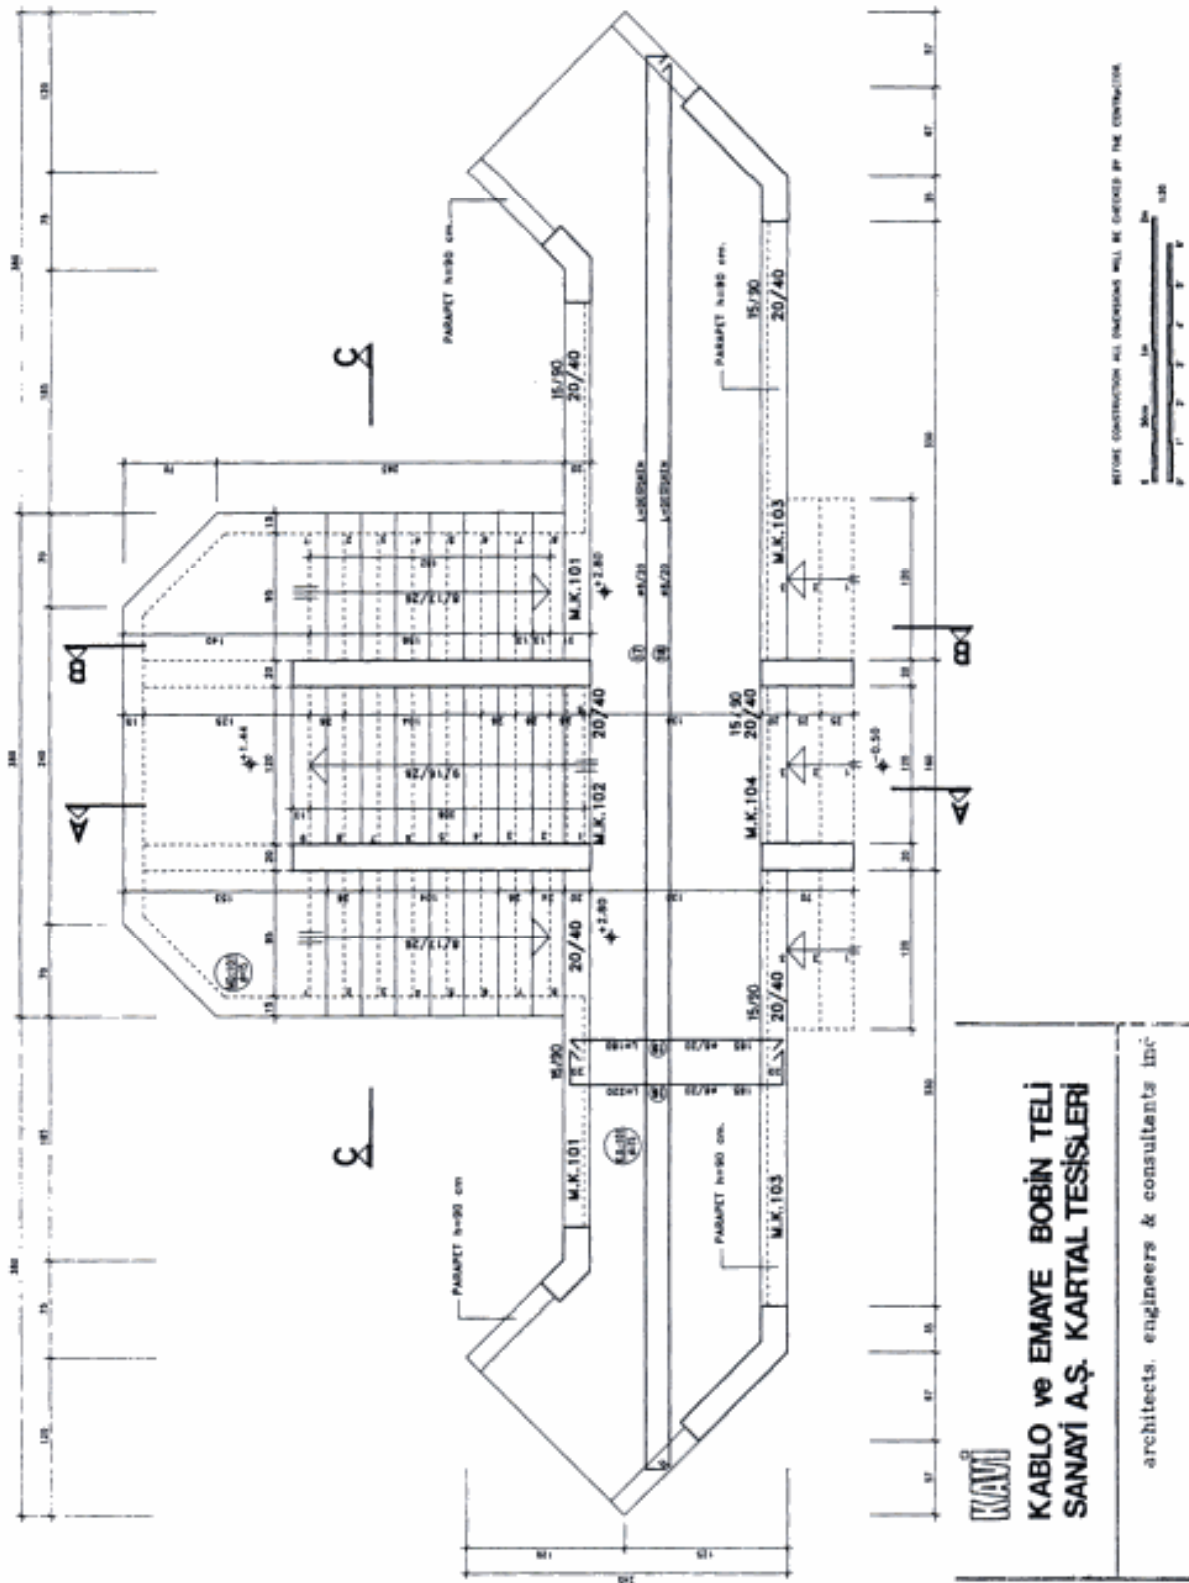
Typical reinforcement details of stairs and landings in a building: STEPS (Turkish/European practice).
